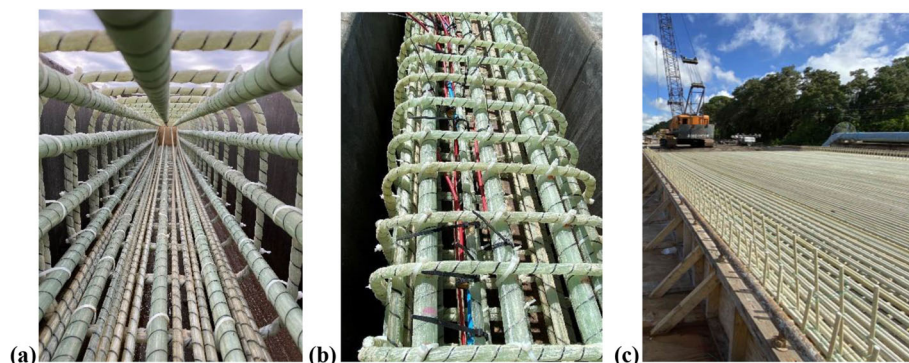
Typical examples of new GFRP-RC/PC construction: a Soldier pile fabrication before tensioning, and b after tensioning #4 bar strands [68]; c CIP flat-slab bridge conservative reinforcing layout
